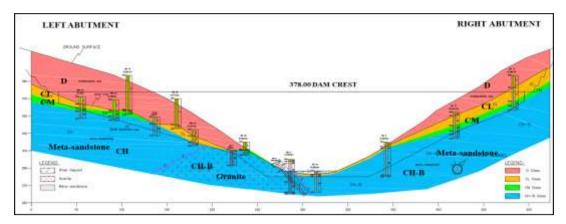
Rock class profile of Upper Paunglaung dam foundation
